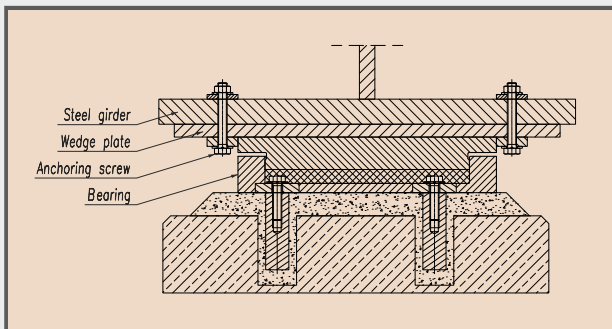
Anchoring system with fixing screws through the lower flange of steel girder
